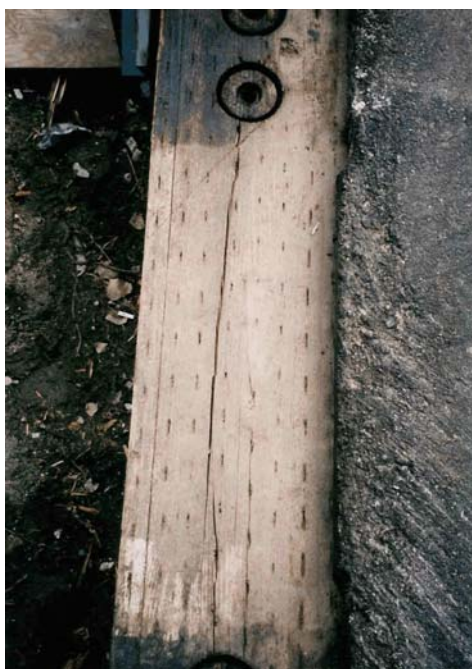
Deck Cracking on Downstream Side of Post No. 4, Test FSCR-1
